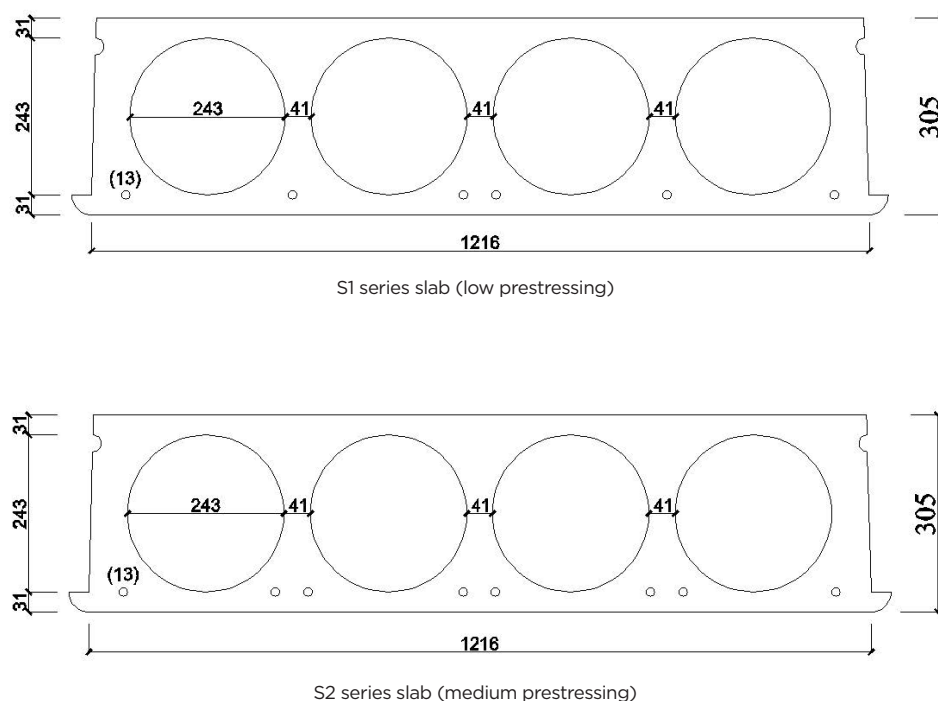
Cross section of S1 and S2 series full-sized prestressed concrete hollow-core slab specimens. Note: All dimensions are in millimeters. 1 mm = 0.0394 in.
